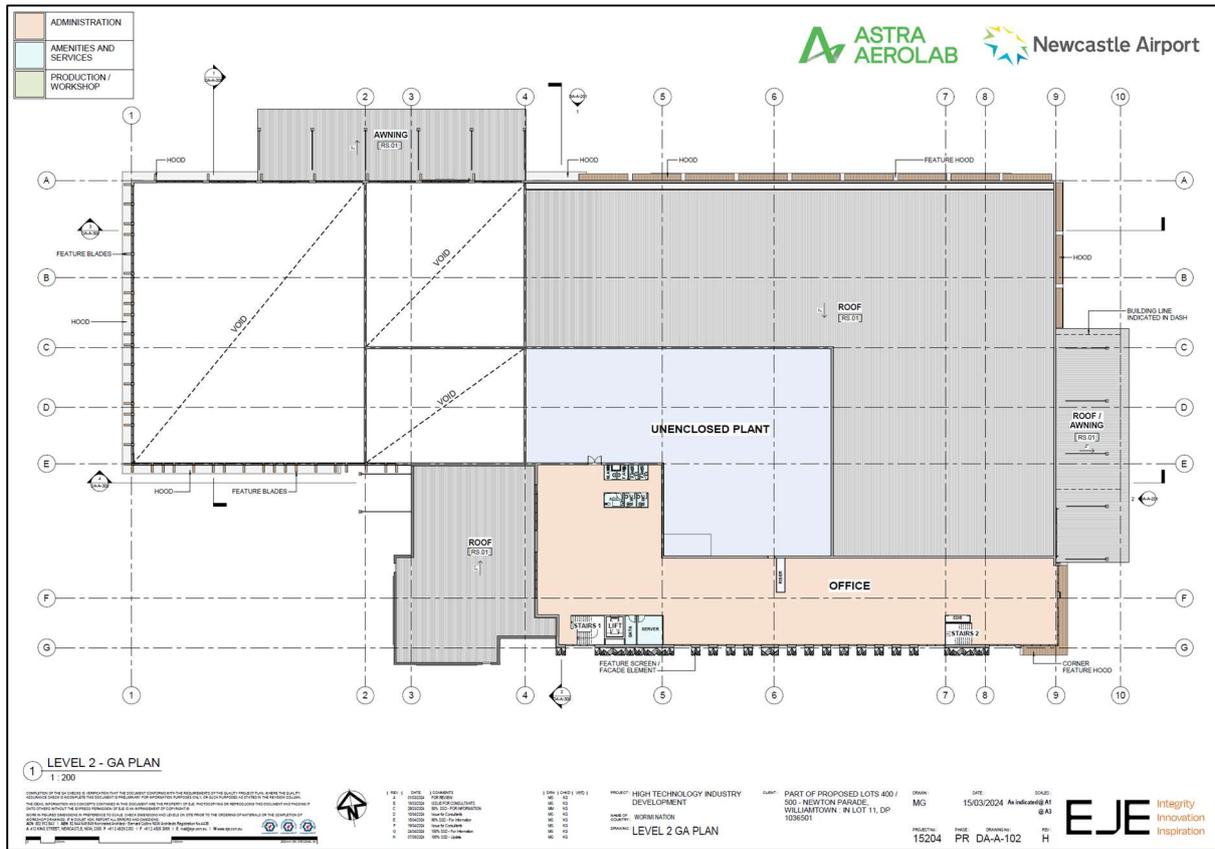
Second Floor Plan. Source: EJE Architecture (May 2024)
